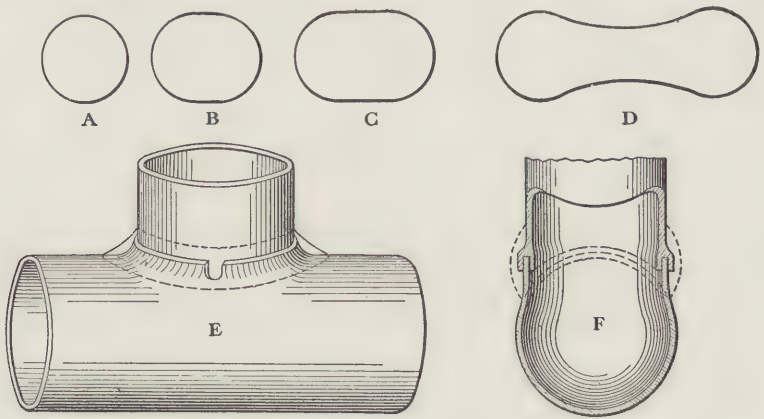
BRANCH OPENINGS FOR WIPED JOINTS
